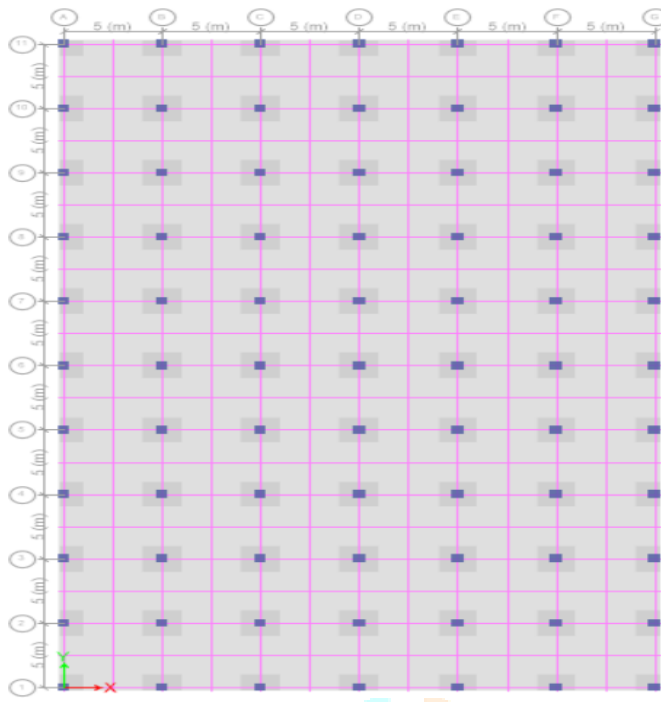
5m Spacing of Columns for RCC Flat slab
